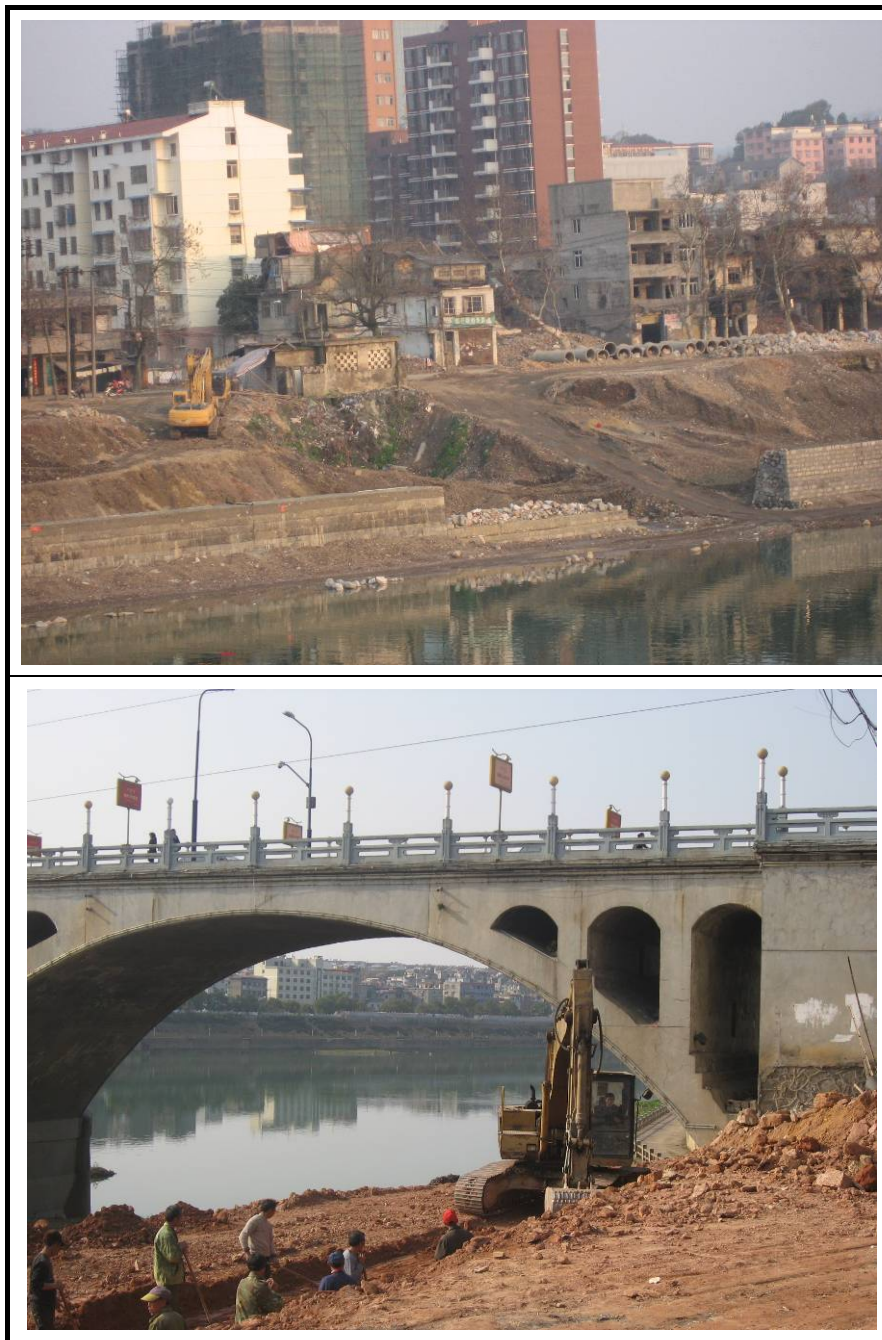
Construction Site of Eastern City Dyke (Cidu Bridge to Zhongdukou)
